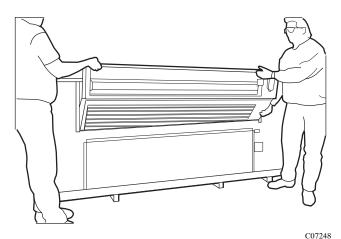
Slide EconoMi\$er IV Assembly Into Unit (13 to 25 Ton Units)
